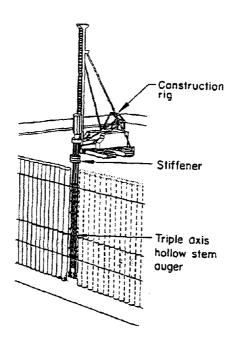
Schematic of the deep soil mixing rig (O'Rourke and Jones, 1990)
